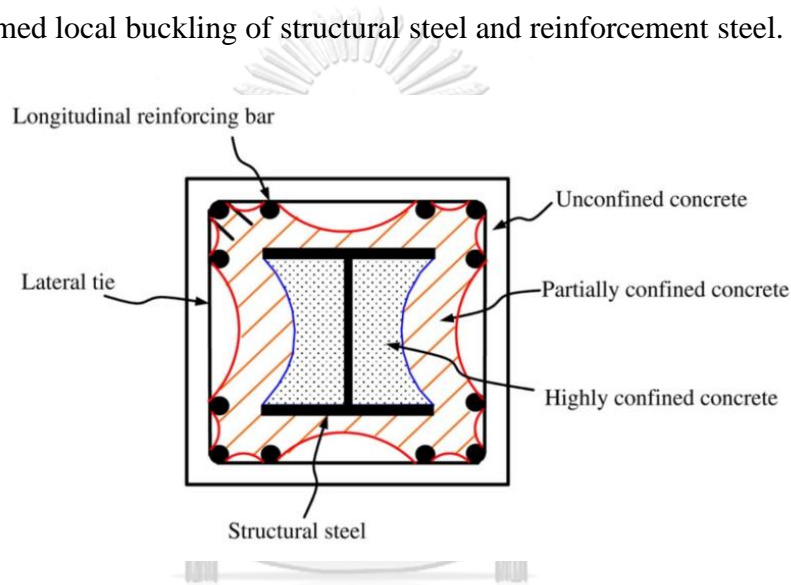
Materials and concrete confinement zone of concrete-encased steel columns (Chen and Lin, 2006).
